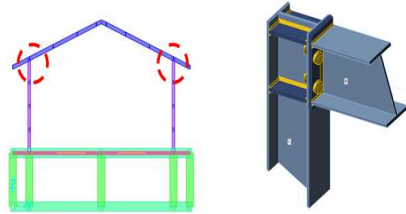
Rafter-to-column connection model in IDEA StatiCa
